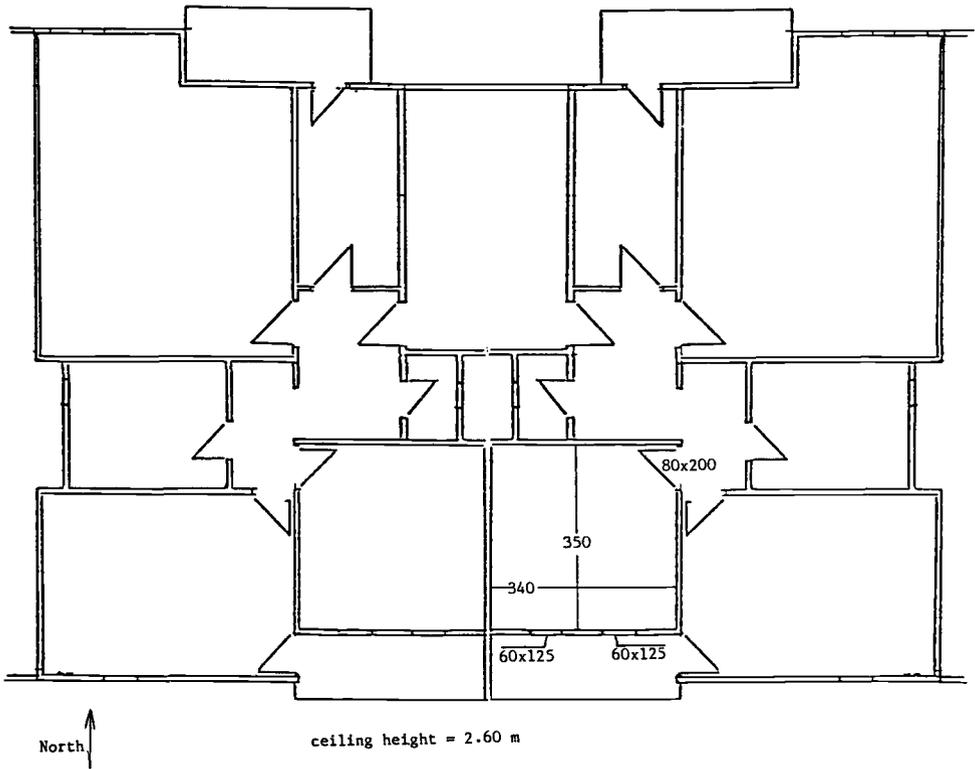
Floor plan of the five story apartment building constructed by folded precast system in the second site.
